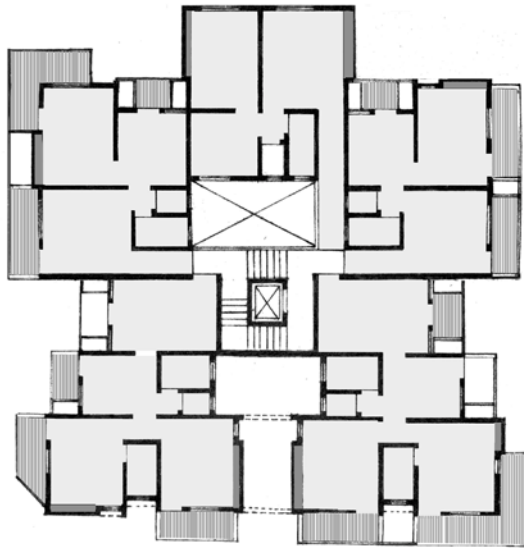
Schematic plan of Nishat Apartments. Note the balconies (hatched) and protruding wall cupboards (grey fill) which were exempted from FSI. Space Designers' Syndicate, 1982. Source: private office archives of Space Designers' Syndicate.
